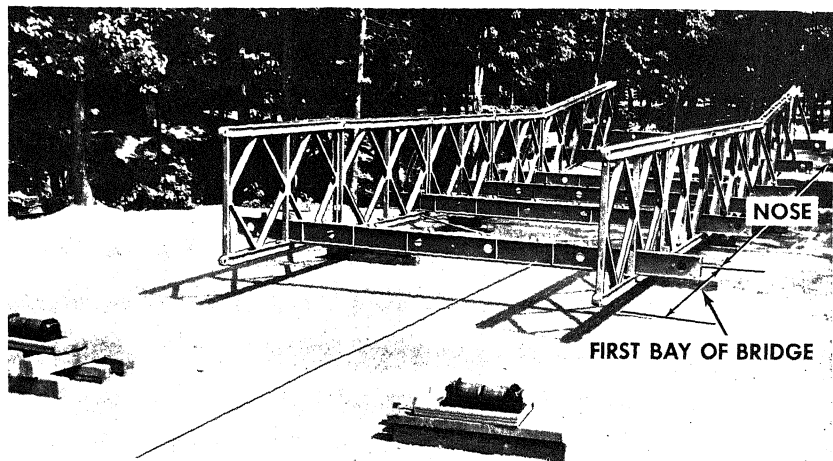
First bay, DS, assembly—single truss panels connected to launching nose.
